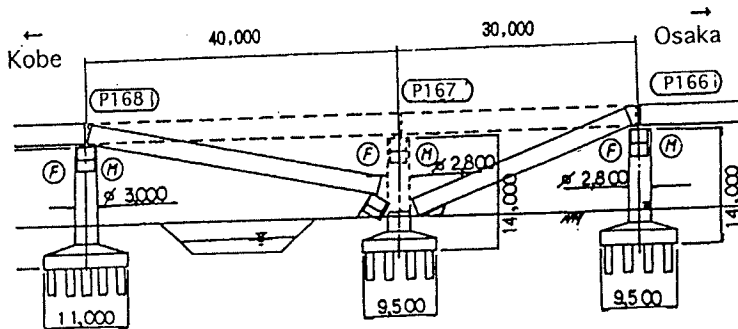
Highway Bridges at Takashio, Route 3, Kobe Line of Hanshin Expressway
